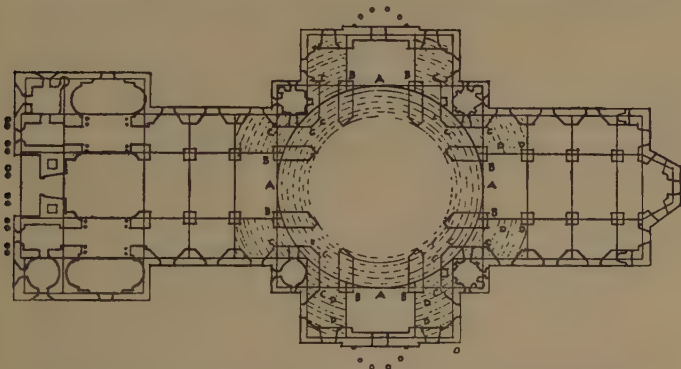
St. Paul's Cathedral. Suggested main lines of reinforcement to be buried in concrete beams in the wall tops; and plan of reinforced concrete truncated cone to underpin the outer and inner drums and spread their weight over the surrounding masses of masonry. None of these measures will interfere with either the external or internal appearance of the building.
